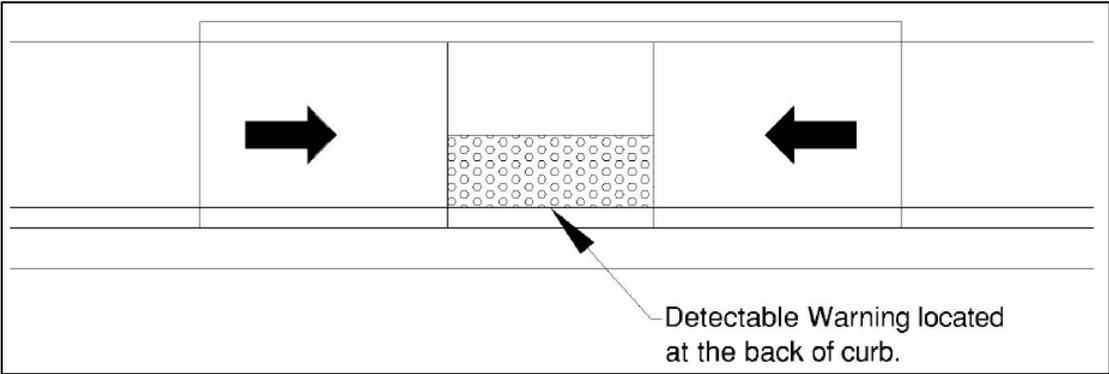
B - Detectable Warning Surface Placement (Parallel Curb Ramps)
